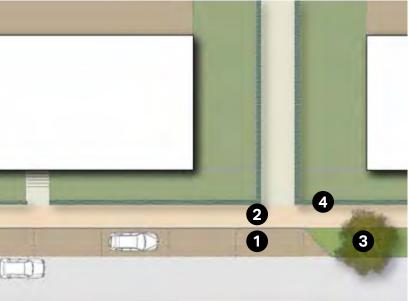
Illustrative diagram showing an indicative layout of on-street inset parking.
